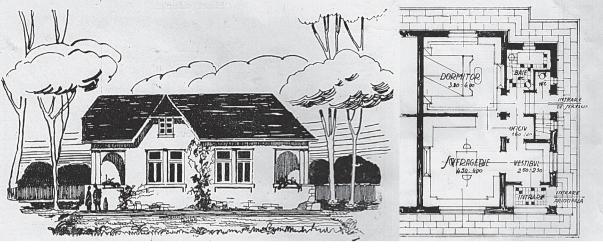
(previous page, left, from the top) "My Cottage": [a - perspective, b- floor plans]. Author: arch. Florea Stănculescu Fig. 7. (previous page, right, from the top) "Apartment with ground floor and first floor" [a - perspective, ground floor and first floor plans]. Author: arch. Florea Stănculescu
